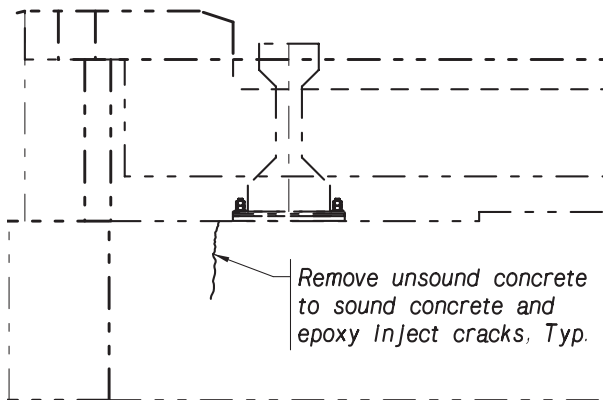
Epoxy Crack Injection Plan Note (example taken from S283 05534 CN 71185, 2018)
